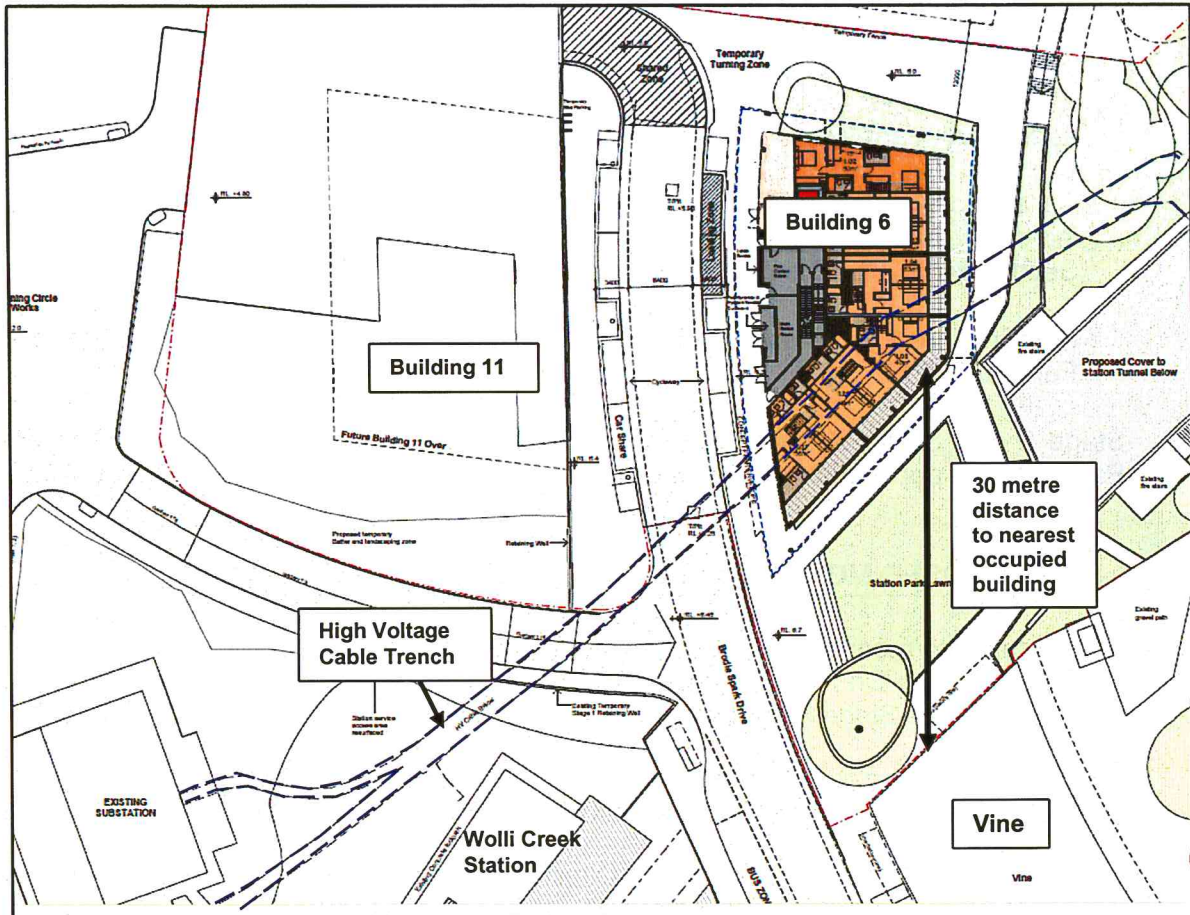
Location of building 6 and RailCorp high voltage cable trench
